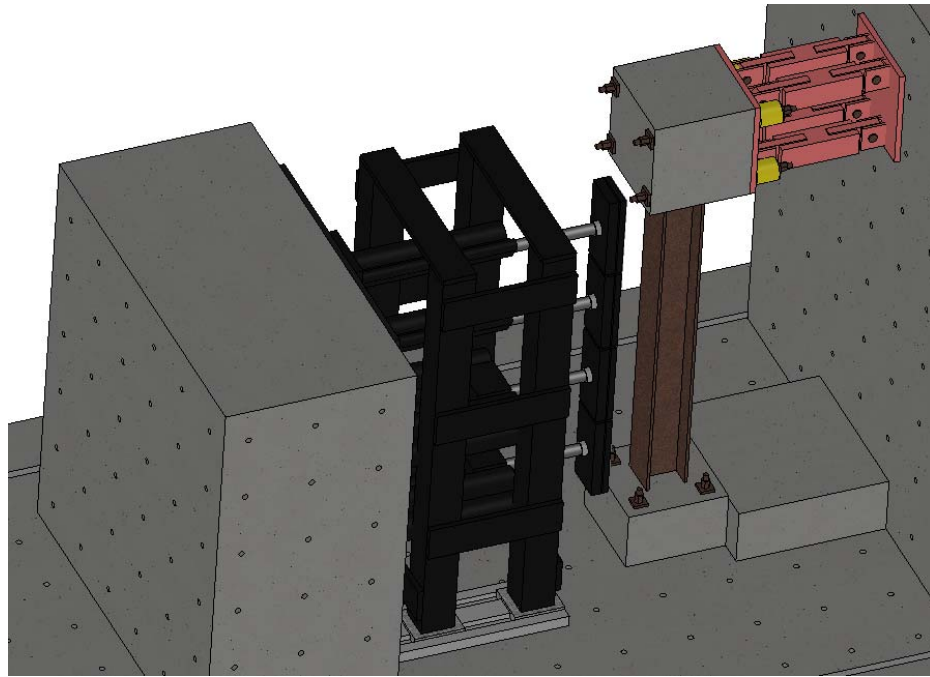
Elevation of Steel Column Strong Axis Test Setup
